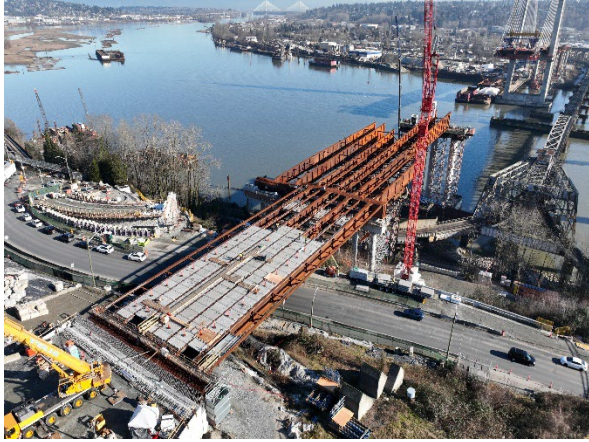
North Approach girder erection continues above Front Street in New Westminster.
